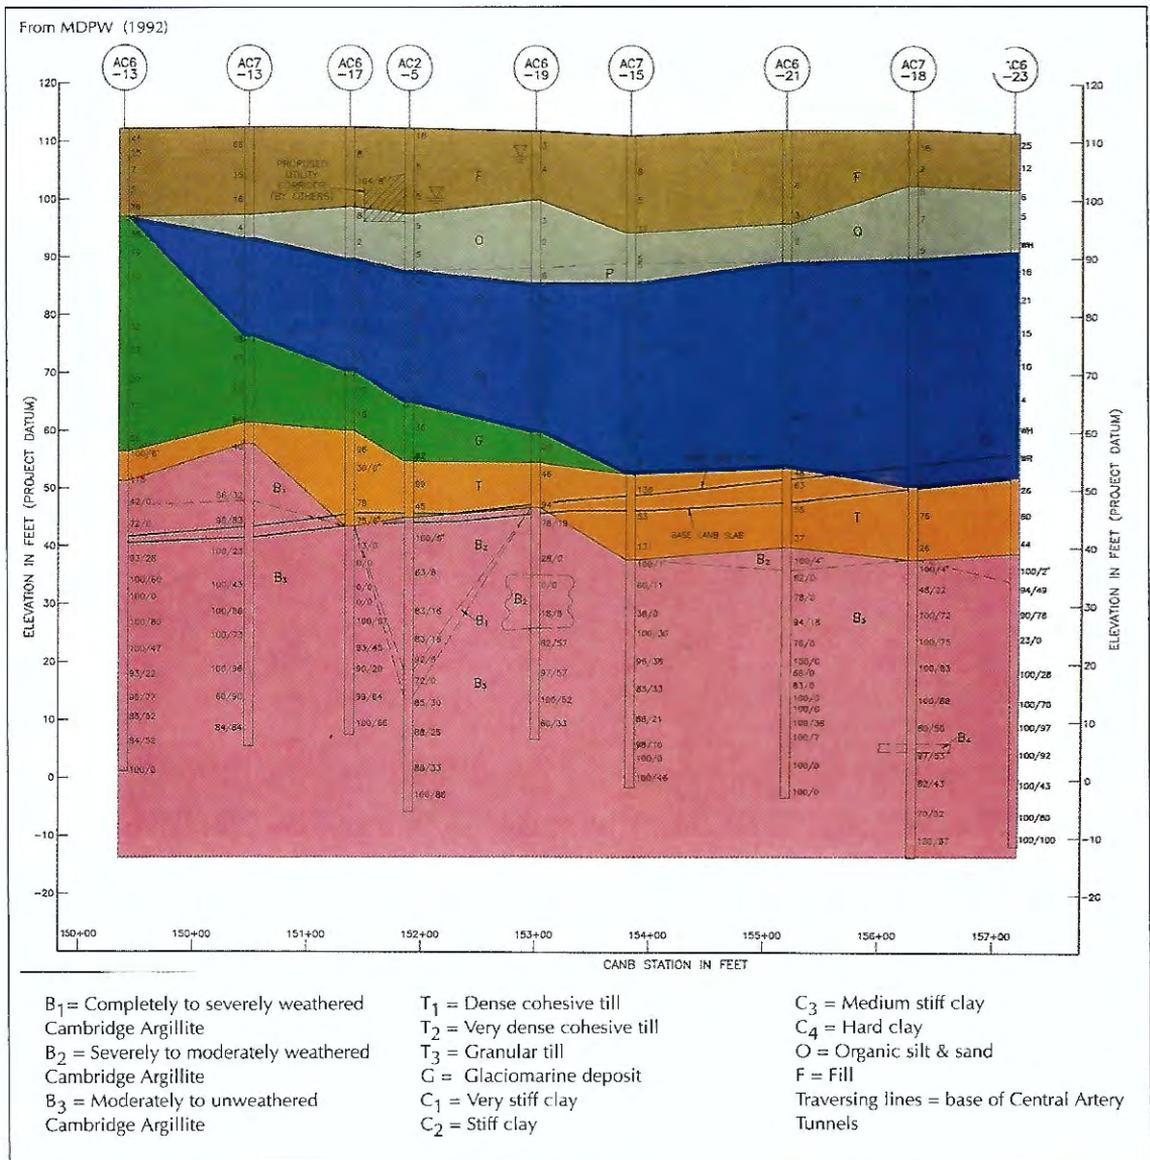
Section along the Central Artery Tunnel from Congress Street to Fleet Center near the Charles River, middle slurry wall between Stations 150+00 and 157+00 (view west to southwest).
